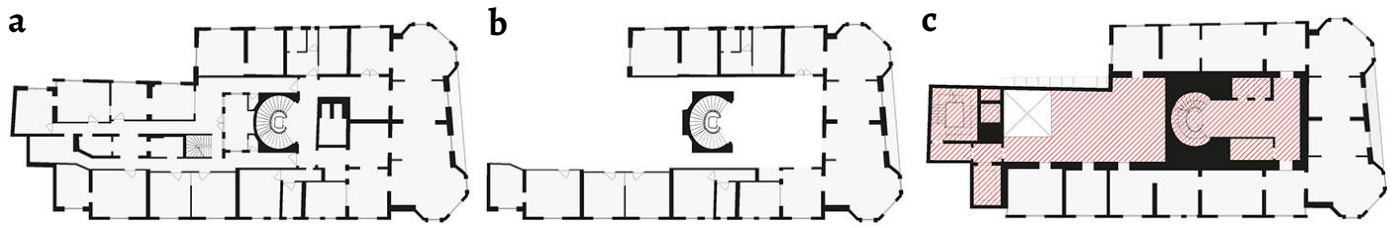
Adaptive reuse strategy of the museum: *a)* existing situation of the plan layout; *b)* protected shell and the staircase of the old building; *c)* new technical core addition (red area) [31].
